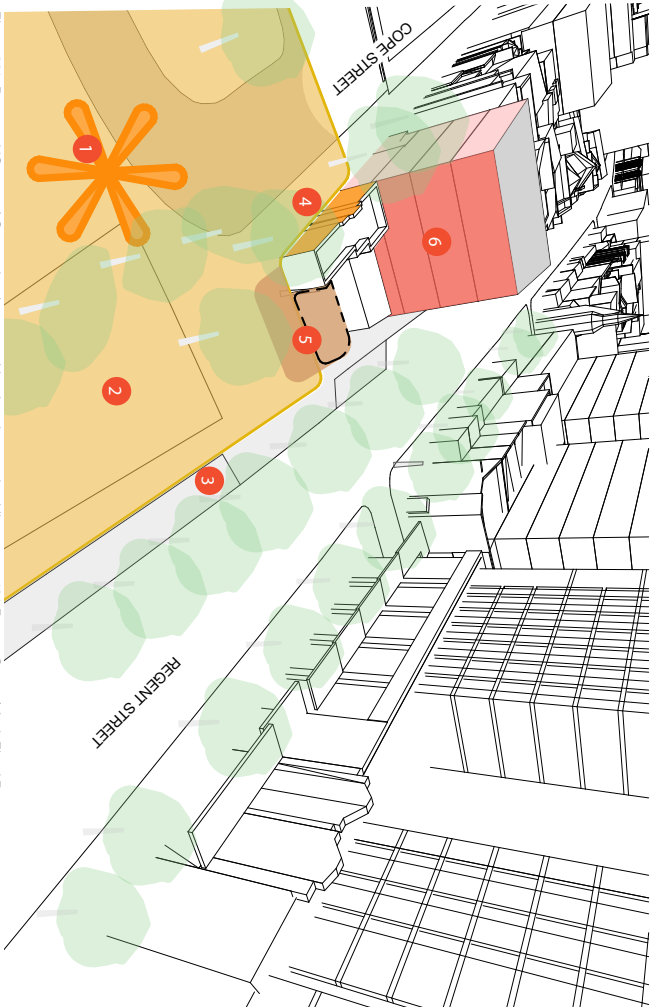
Proposed 'Gateway' Corner development with privately owned public space - 131 Regent Street / Jack Floyd Reserve
